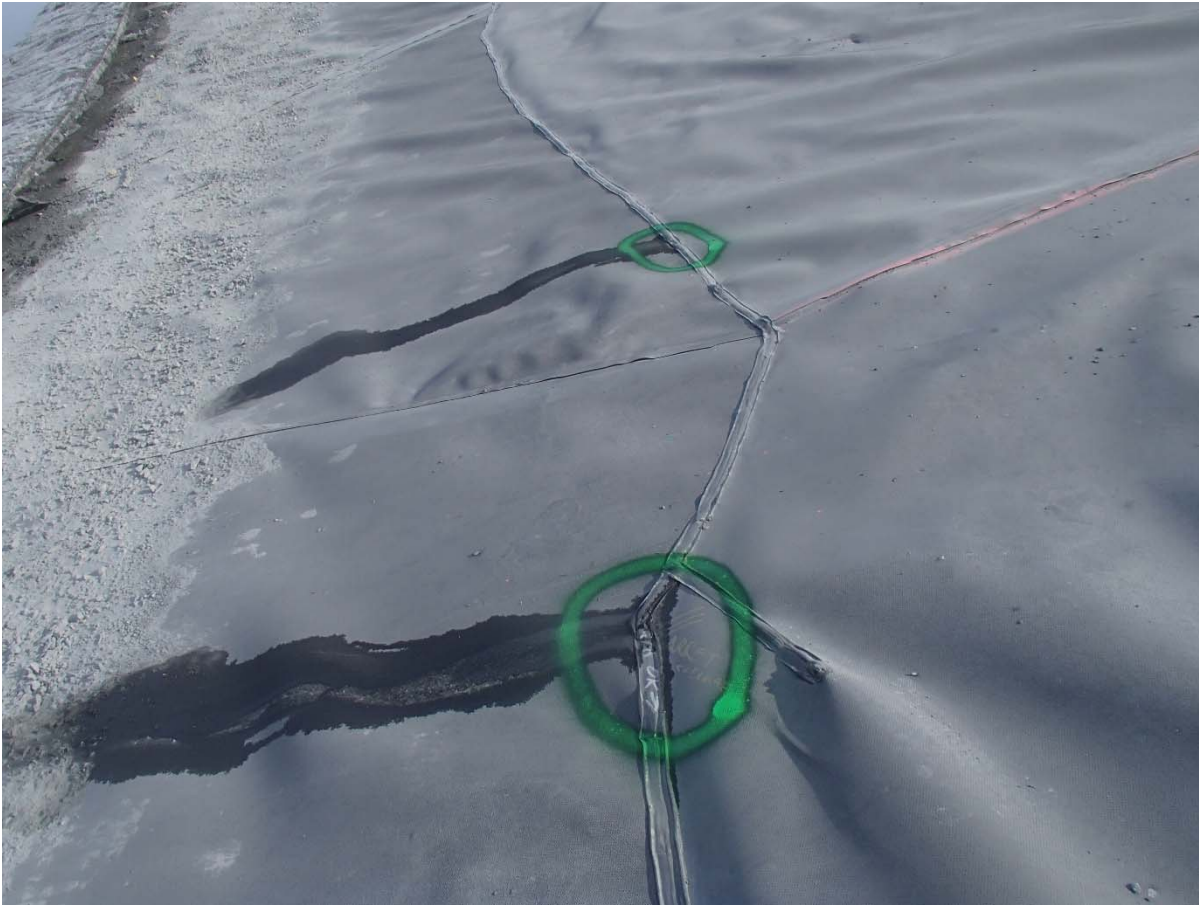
From Sta. 0+150/-28 m, looking N. View of the underlying liner that has been cut at around Sta. 0+160 m to drain the water.
